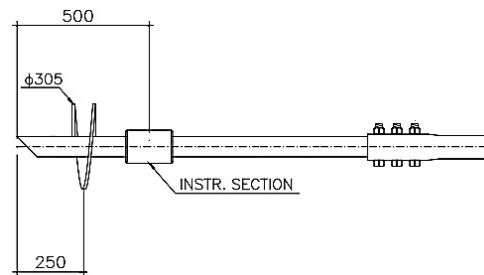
Instrumented lead section of the helical anchors tested (dimensions in mm).
